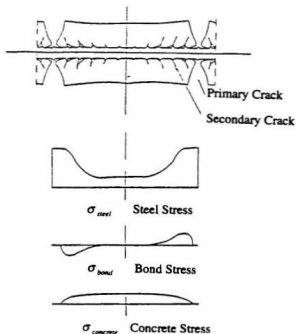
Reinforced concrete in a cracked state
